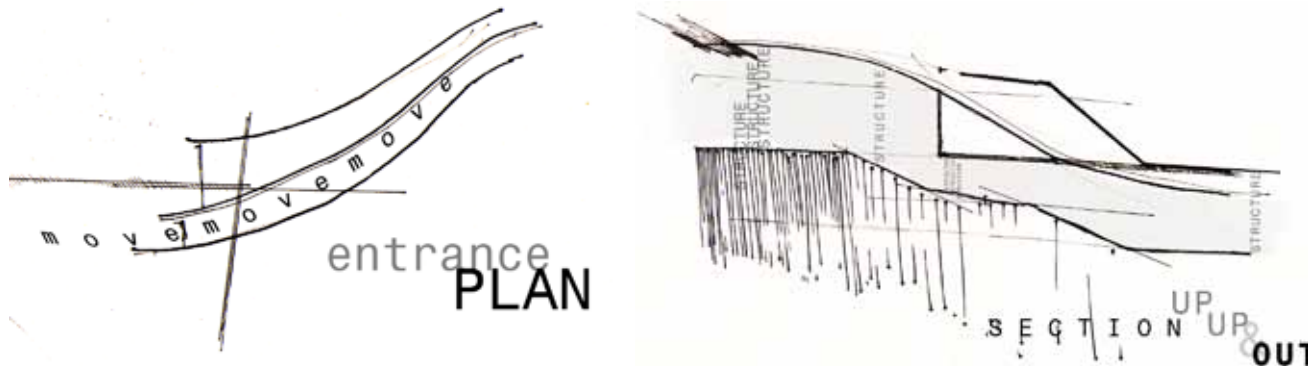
Conceptual plan and sections, structure conveying movement and change [Source: Author]
